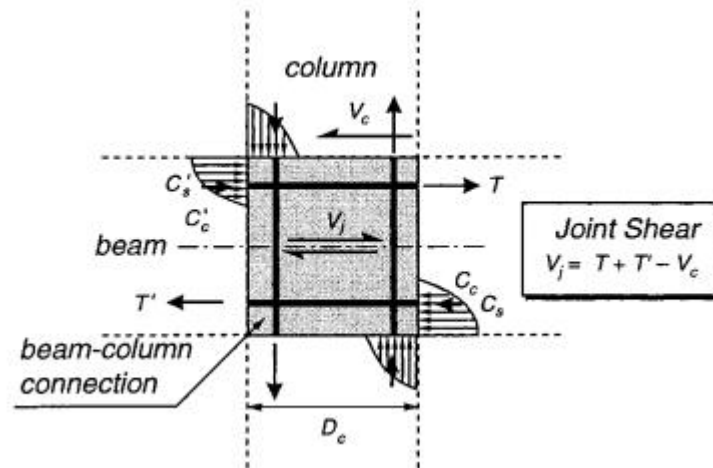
Definition of Horizontal Joint Shear in Interior RC Beam-Column Joints
